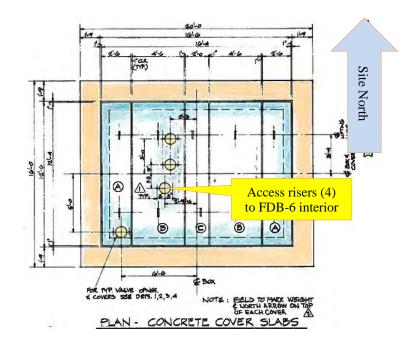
Plan View of the FDB-6 Cell Cover Slabs and Vault Access Risers
